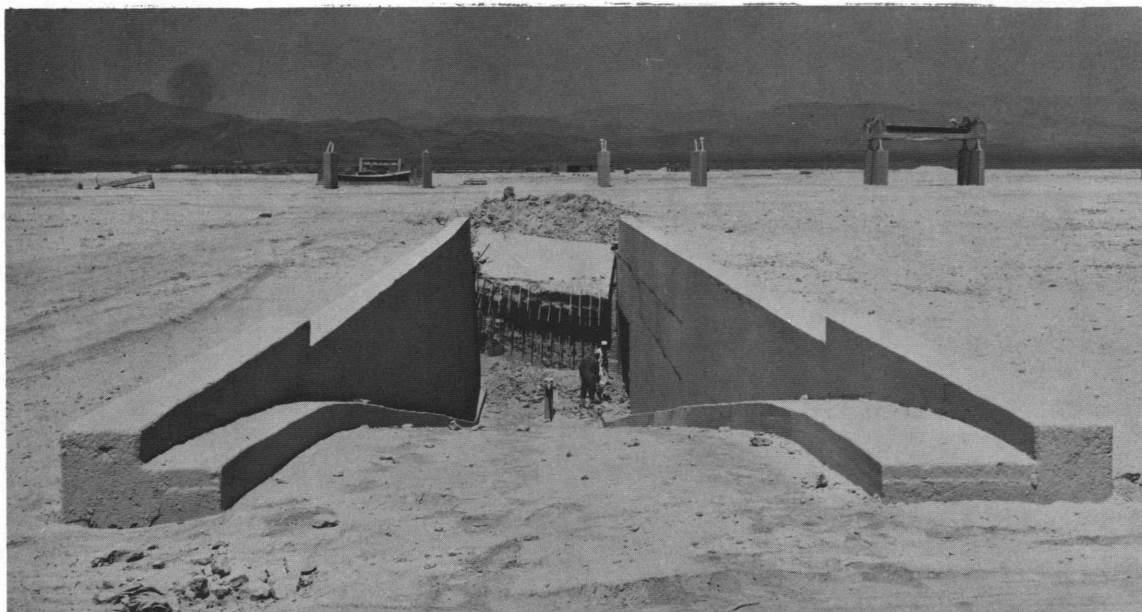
View of ramp looking toward damaged end wall, postshot.
